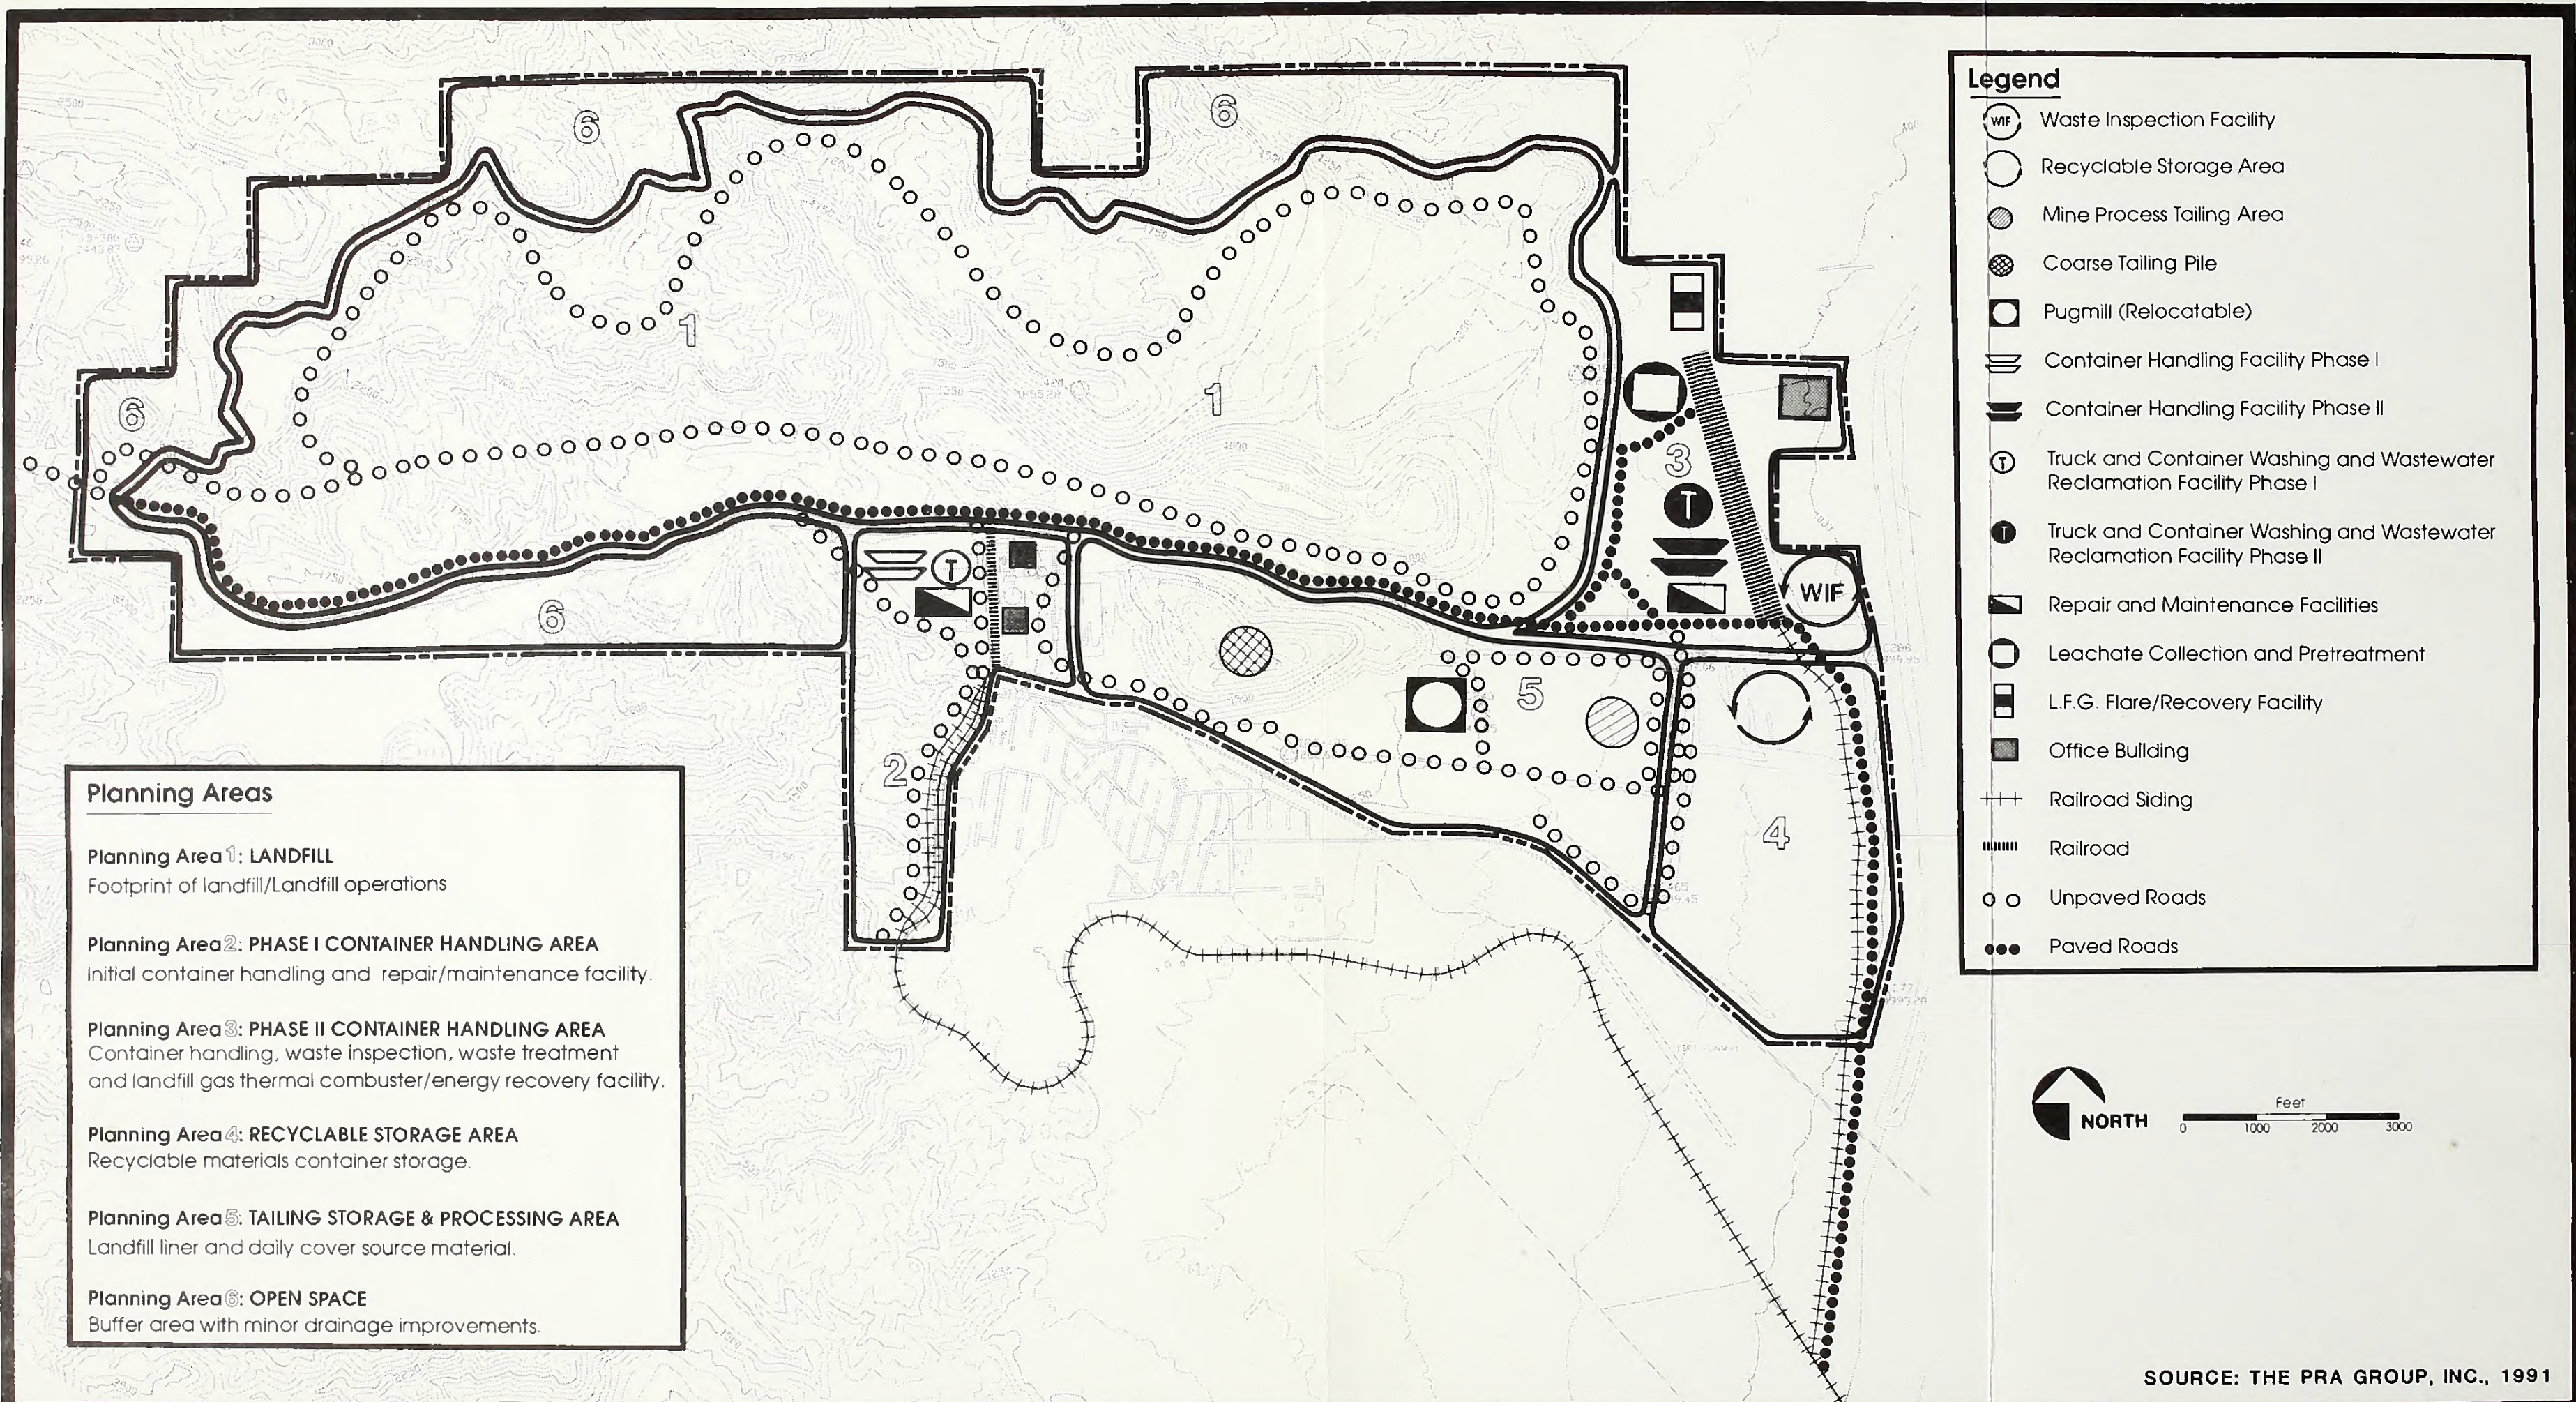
PROPOSED LANDFILL SPECIFIC PLAN AREA WITH DESIGNATED PLANNING AREAS
